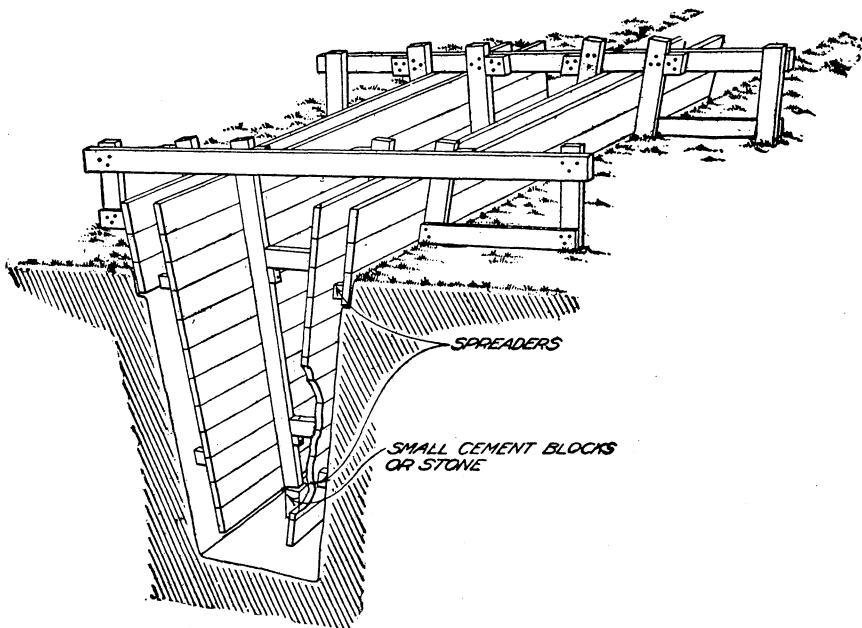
Section of trench for cement vat with sloping sides, showing the forms in place and one method of bracing.
